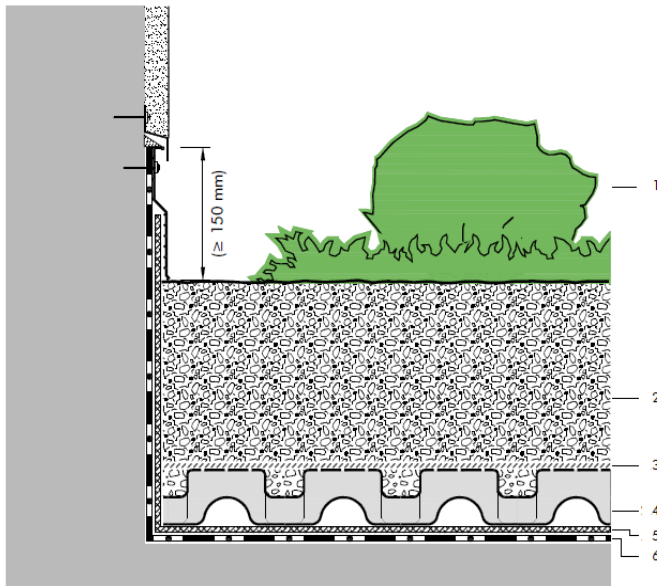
Lawn, perennials, shrubs and trees.2 .System Substrate .3.Filter Sheet .4. Drainage Element .5.Protection.6.Roof construction with root-resistant and waterproofing.
